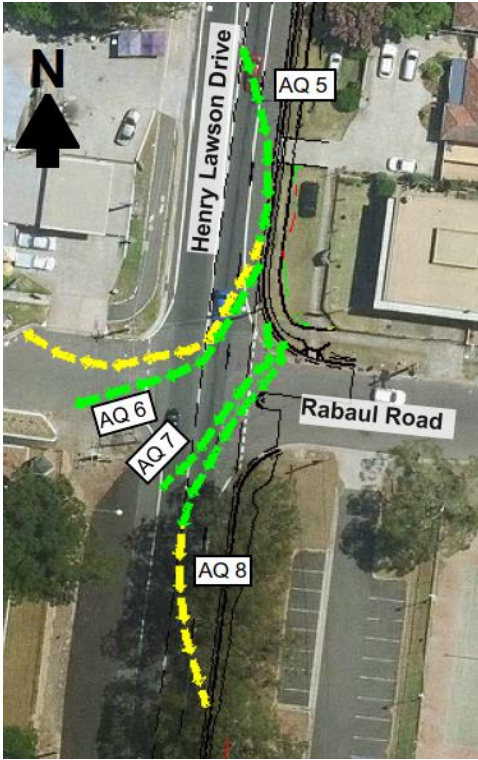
Aquaplaning flowpaths at Rabaul Road intersection
